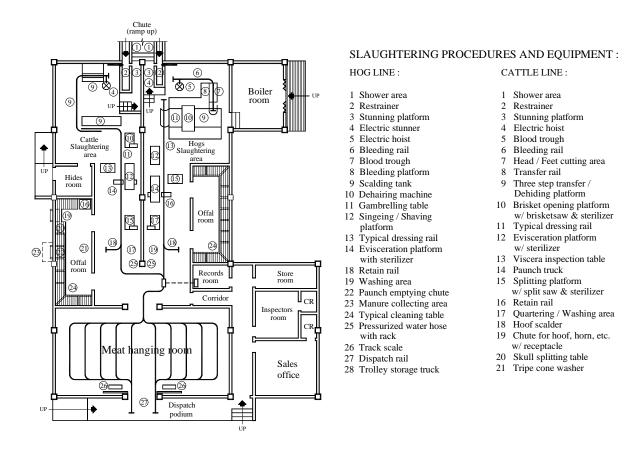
Typical floor plan and procedures for a class AAA slaughterhouse
